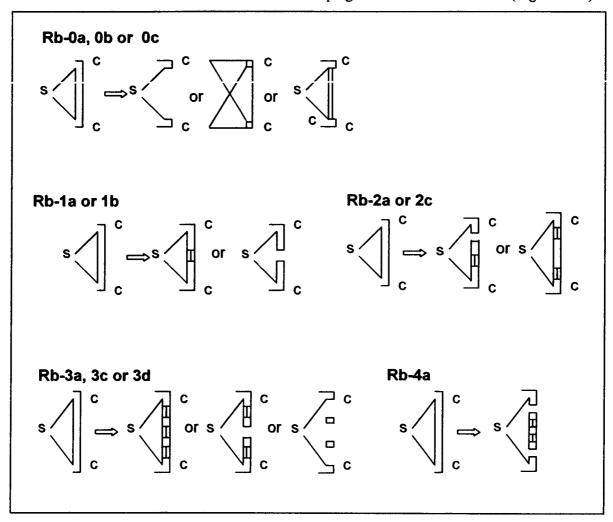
14 Rule B for illustrating the openings on outer walls for floor plans at Dihwa St.71
